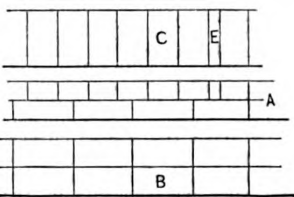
Elevation and Plan Views of Wall Built in English Bond.
